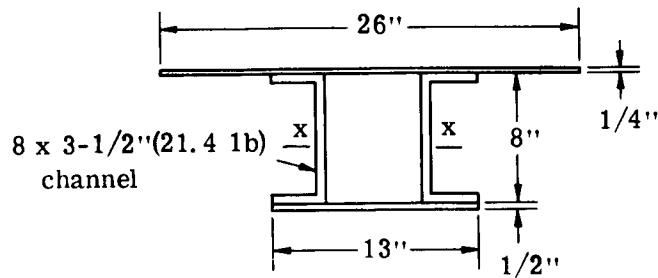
Cross section of transverse beam (section CC, fig. C3).
